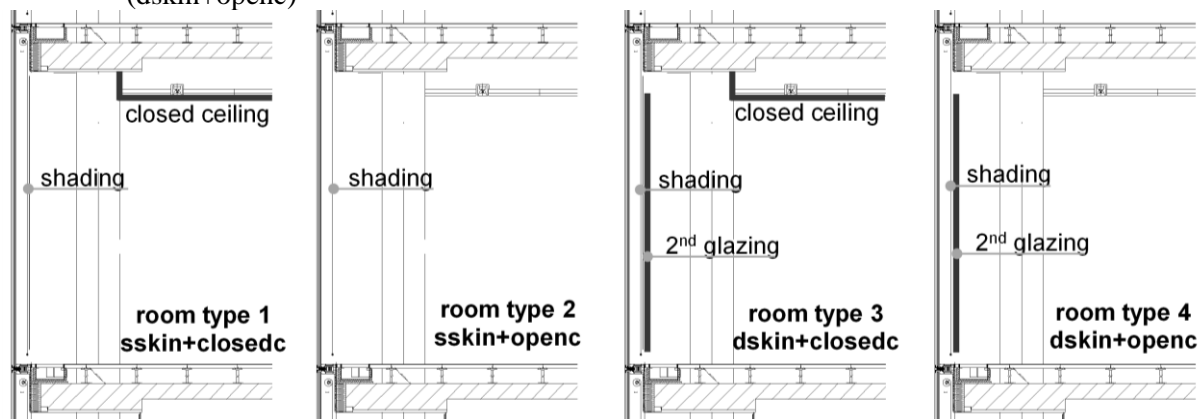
Schematic overview of the four different room types; from left to right: single skin façade+closed suspended cooling ceiling; single skin façade+open suspended cooling ceiling, single
